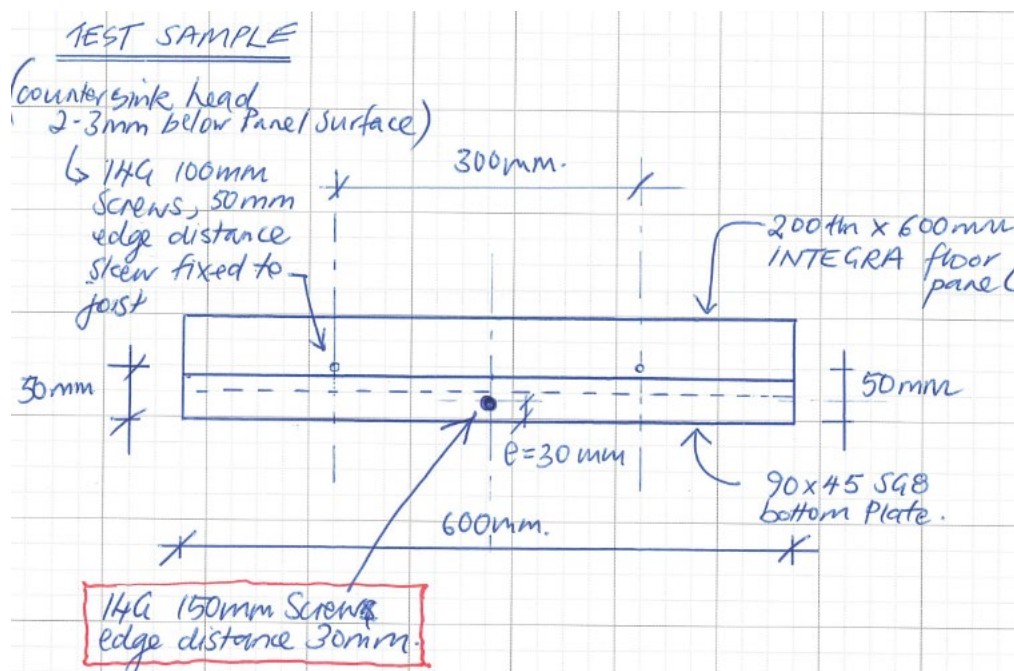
Plan view of test sample for in plane and out of plane shear testing.
